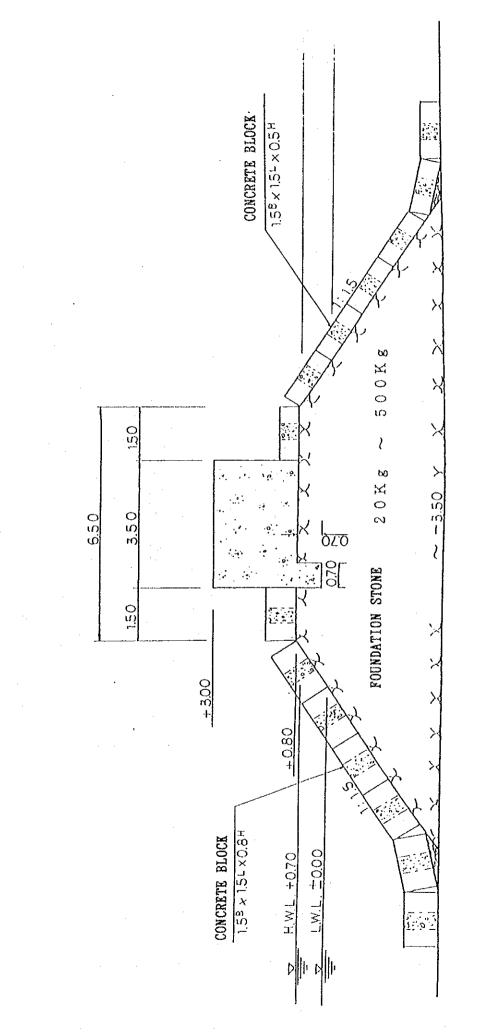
Typical Cross Section of North Breakwater (Section B-B)
